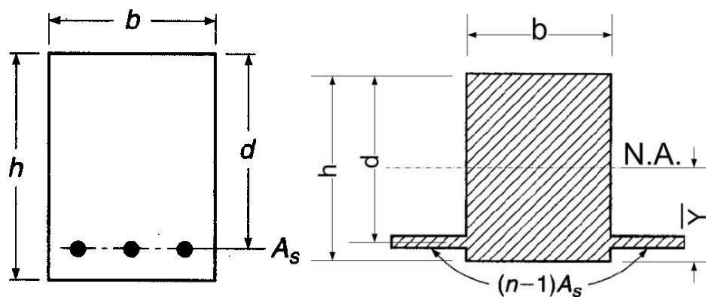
Beam of elastic uncracked section for Example 4.2-1.
